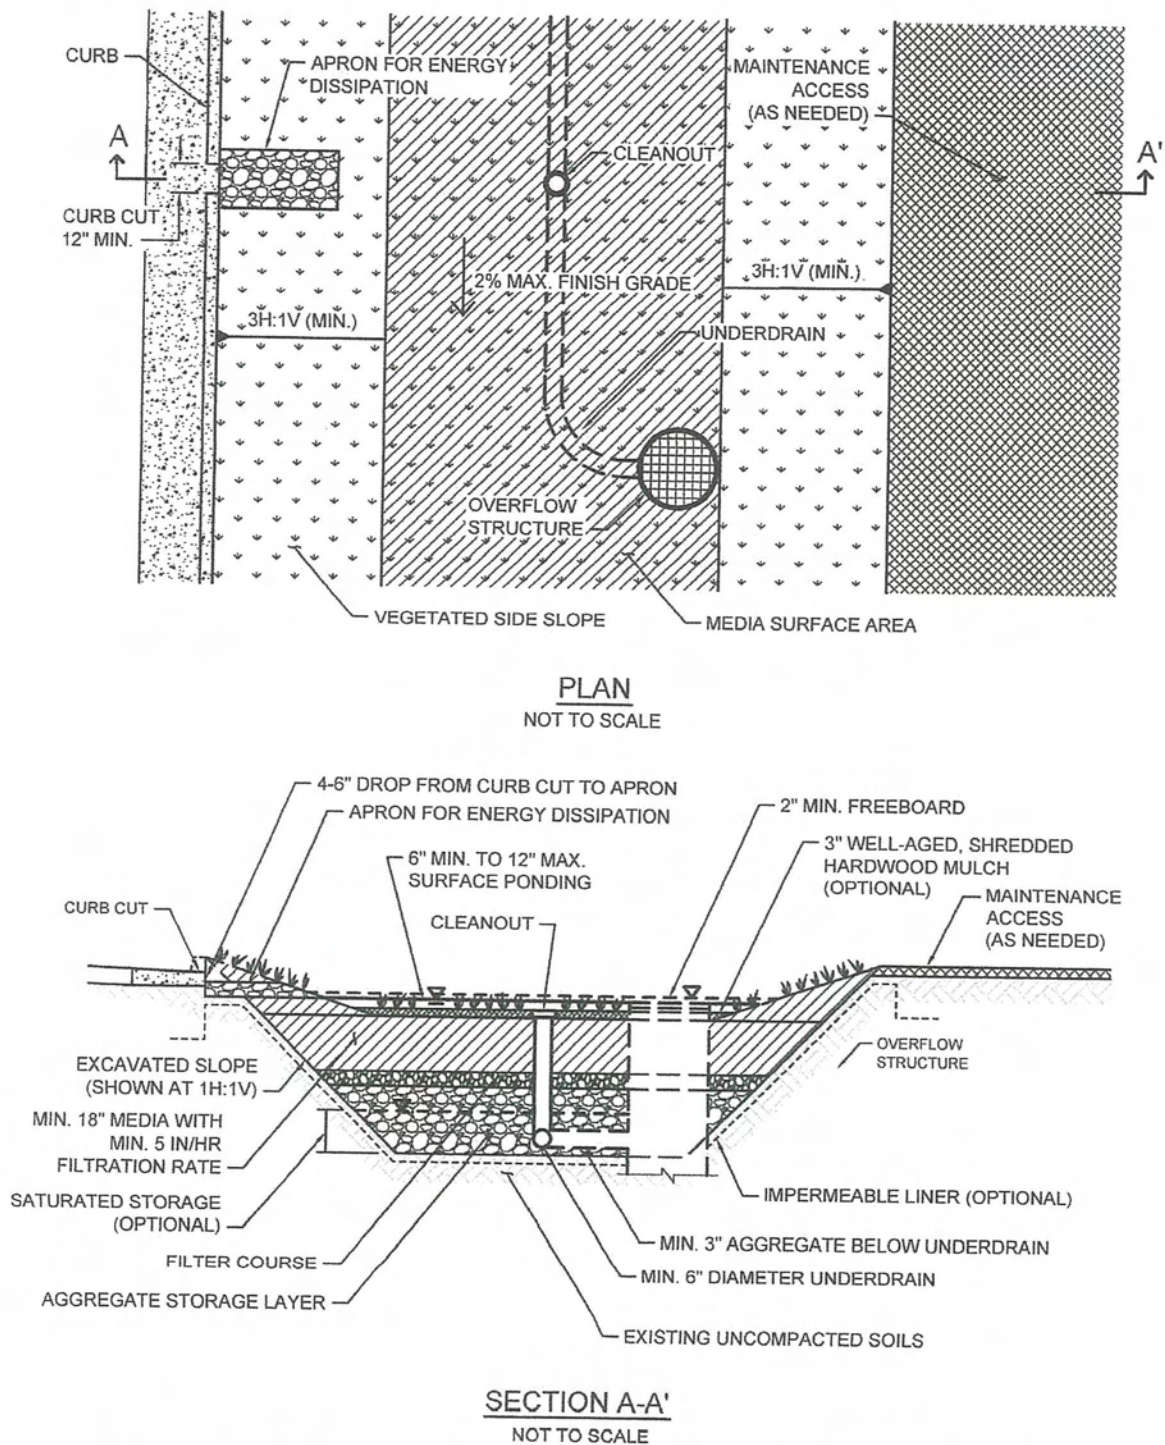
E.13-1: Typical plan and Section view of a Biofiltration BMP
